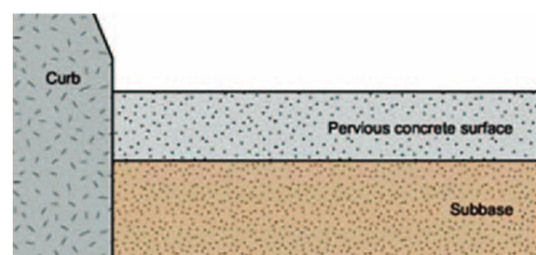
Pervious Concrete Layer Direct on the Subgrade [26]
